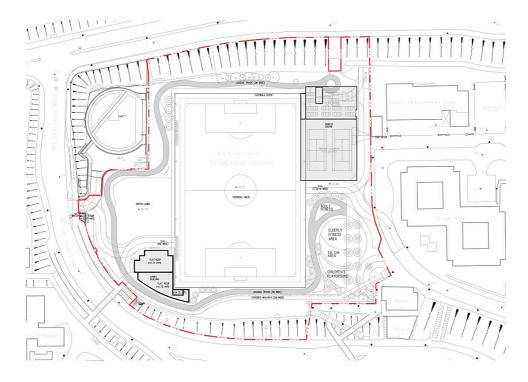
Master Layout Plan under Proposed S16A Application Scheme
